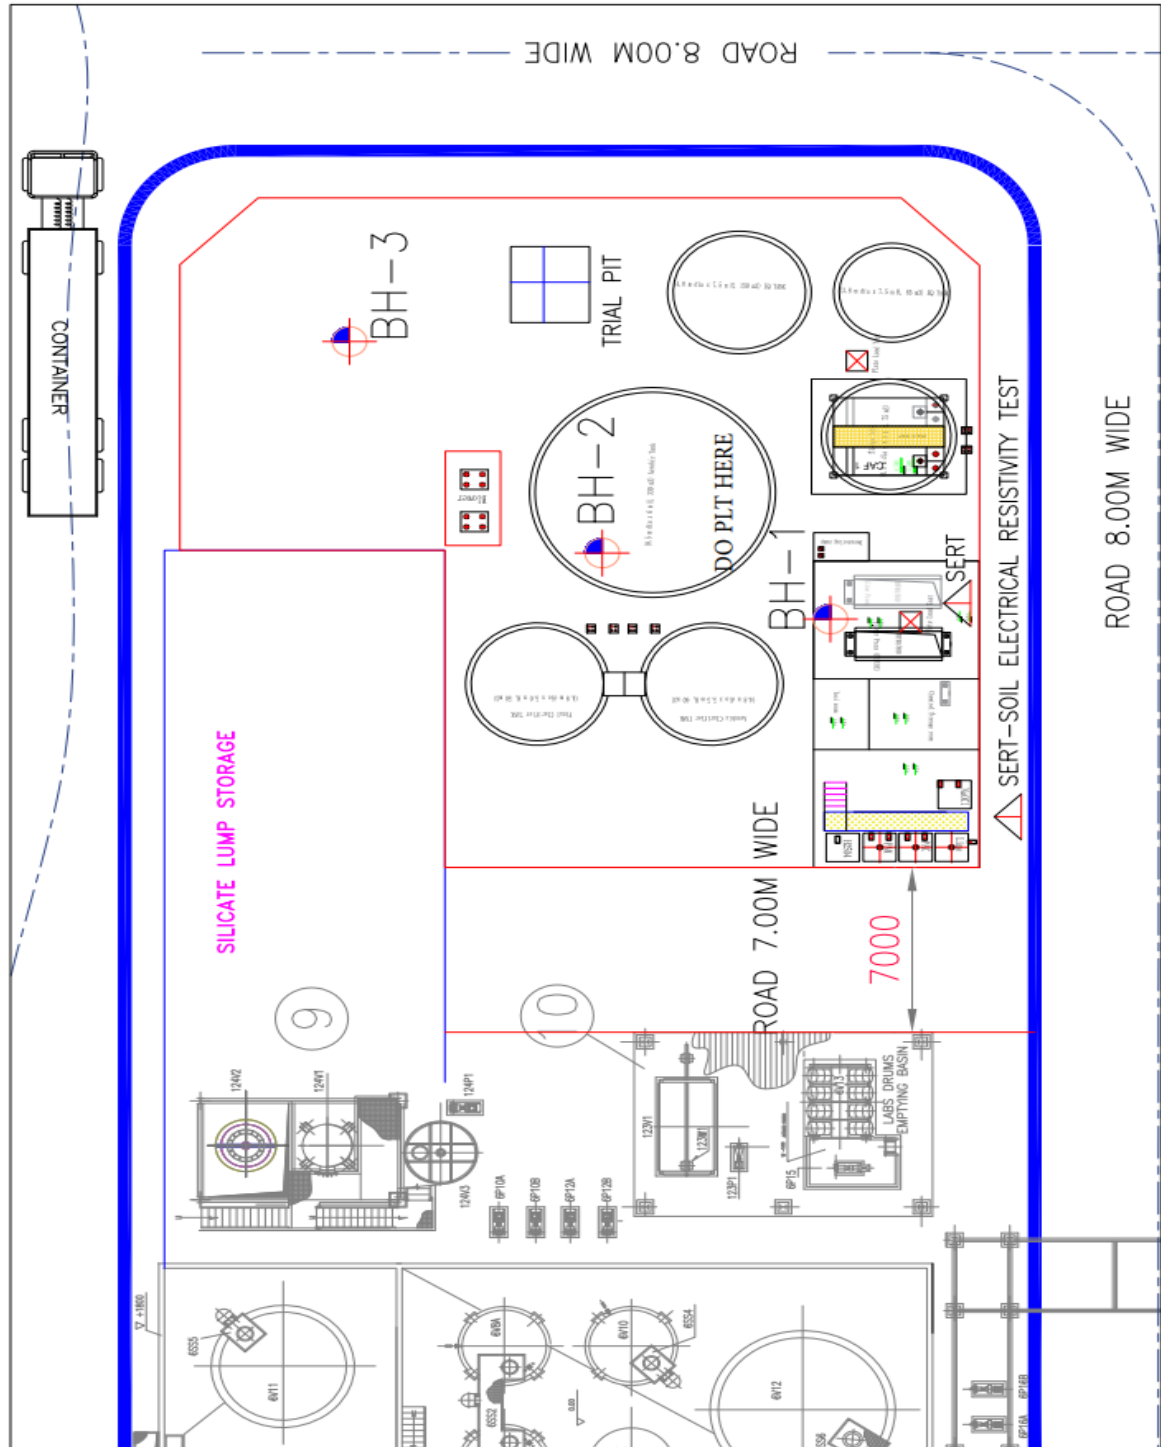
Site Plan Showing Location of boreholes, test pits, and CPT Locations of Effluent Treatment Plant Project.
